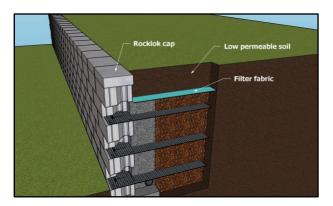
Place filter fabric, low permeable soil and Rocklok<sup>®</sup> capping unit (optional)
